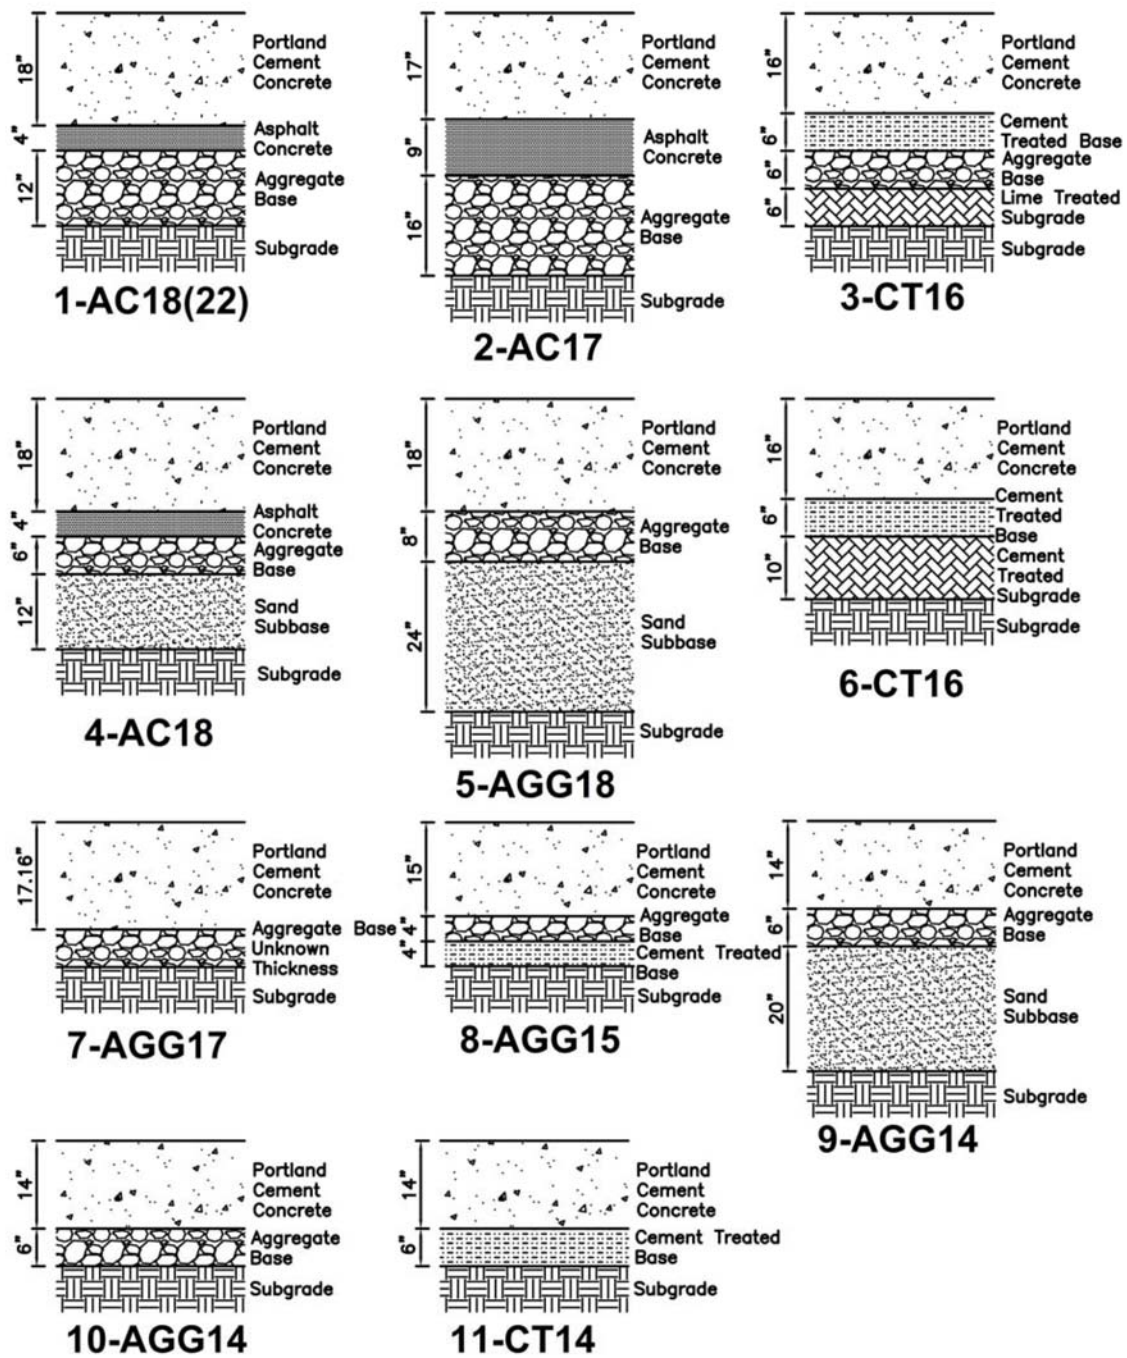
DESIGN SECTIONS FOR THE ELEVEN AIRFIELD TEST SITES
